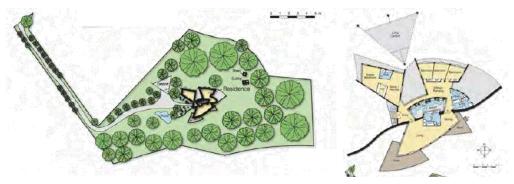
Site plan. (Source: Realestate.com.au 2016)
